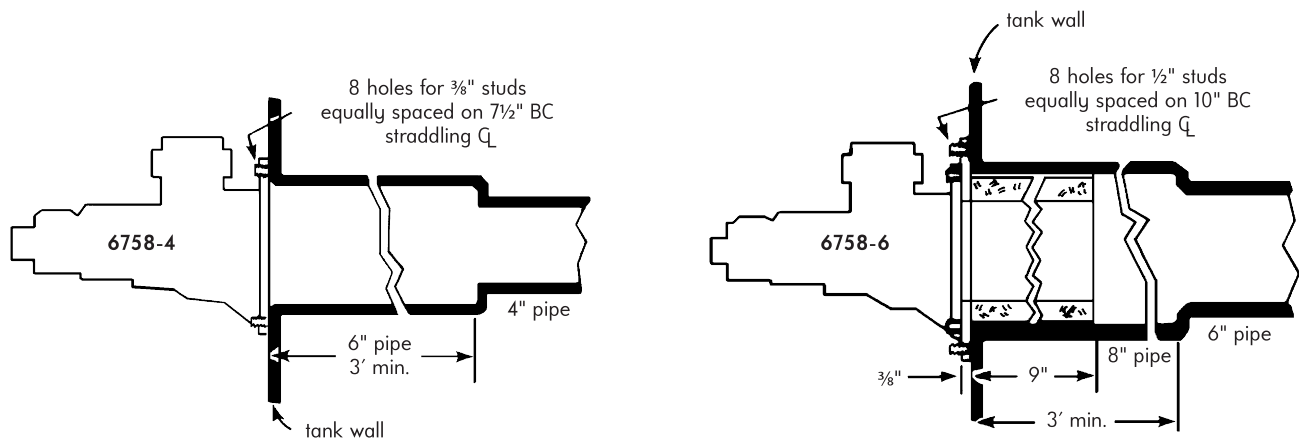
Suggested mounting of 6758 Burners to immersion tubes.
